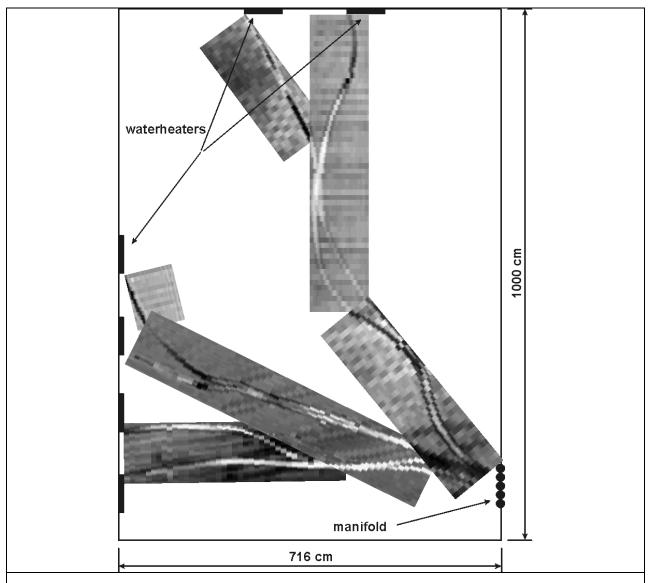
MW images of plastic tubes under a concrete floor covering.
